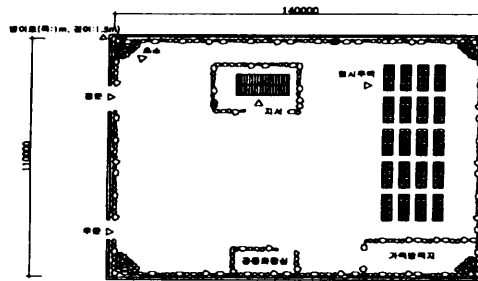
A site plan of wall surrounded 4.3 rebel's village
